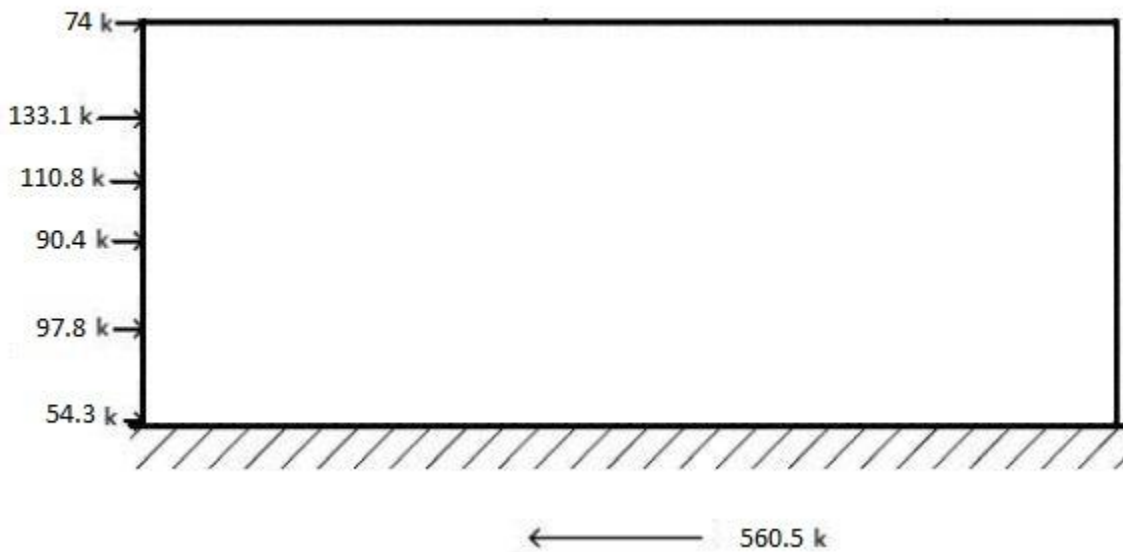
Wind Forces acting at each floor level on the West Wing, North and South facades
